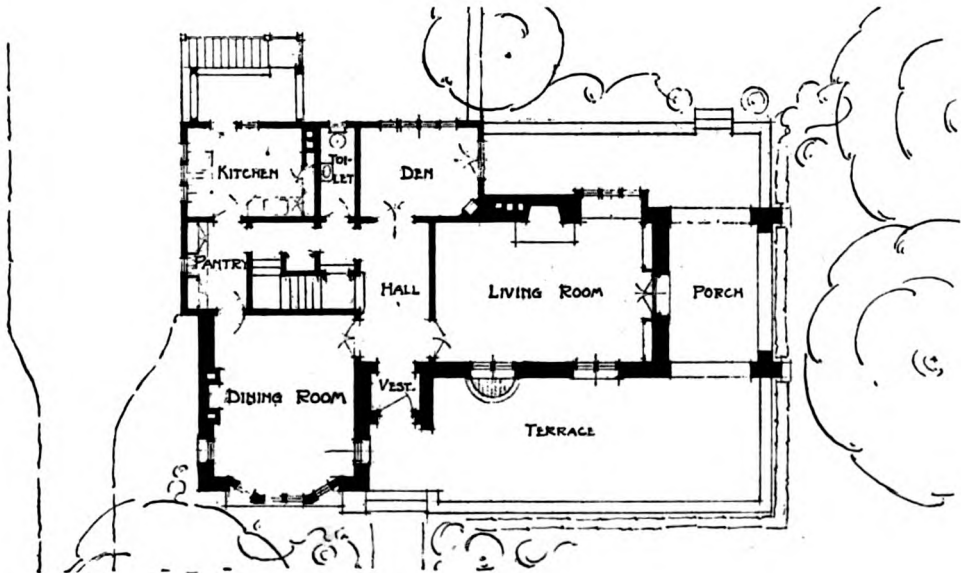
VIEW AND FIRST FLOOR PLAN—
